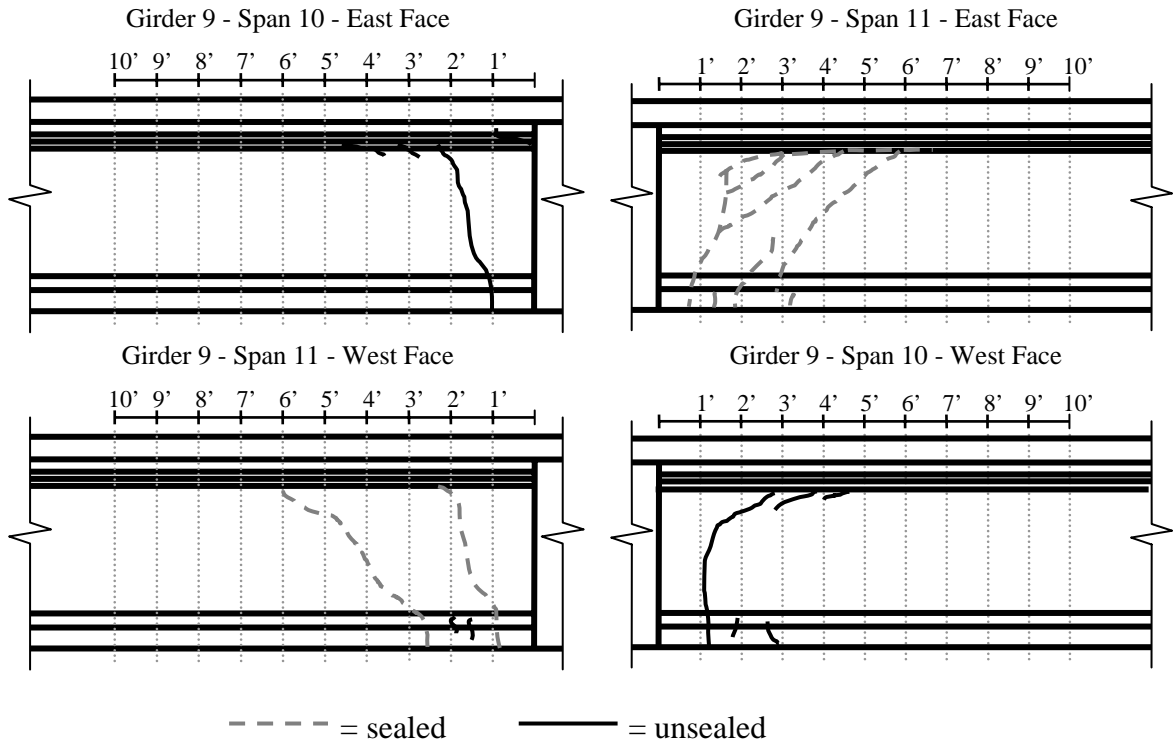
Girder Line 9 Cracking (Fason and Barnes 2004)
